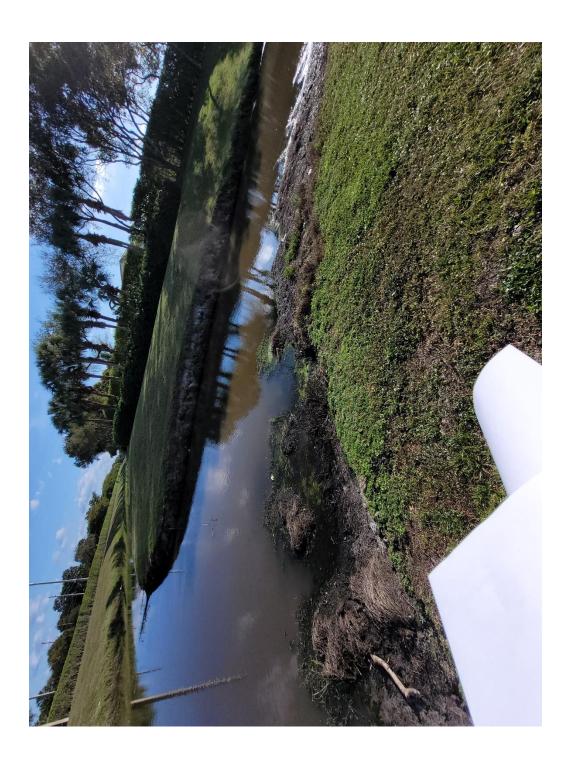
NW 72nd Avenue canal section, looking south. The photo indicates the bank erosion and silt build up at the canal intersection.
